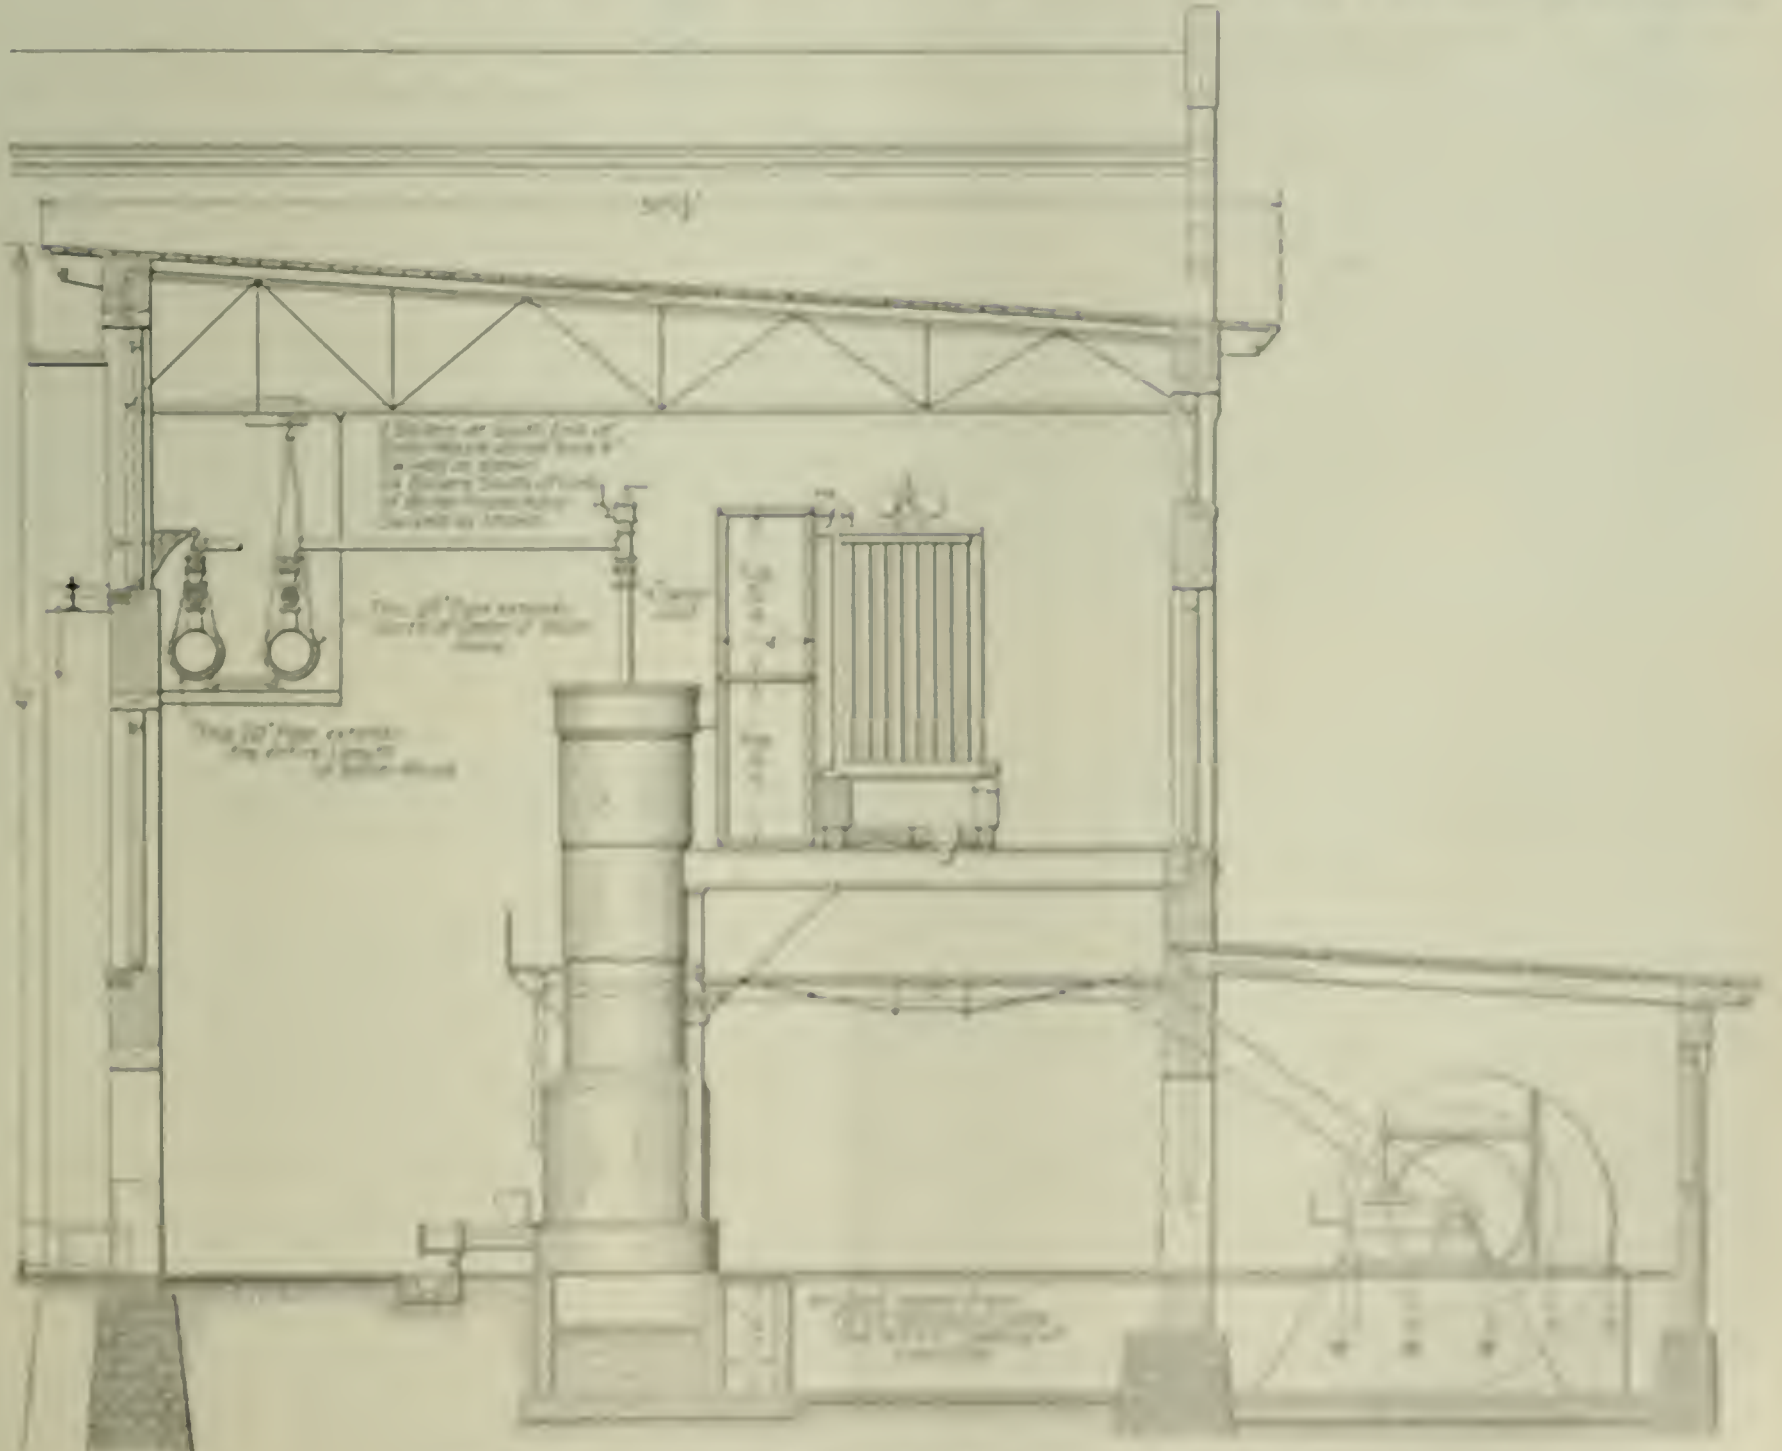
CROSS SECTIONAL VIEW OF THE BOILER ROOM SHOWING DRAFT
